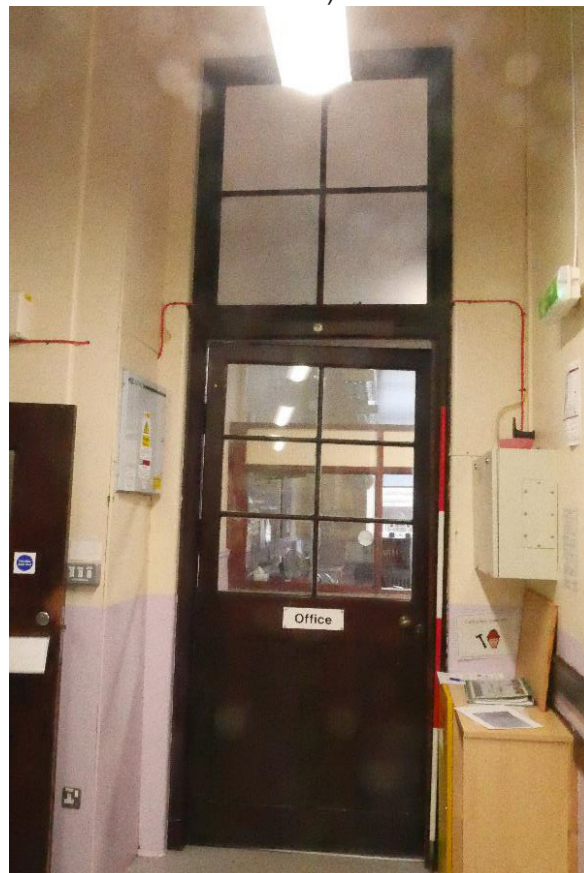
Detailed view of door leading into Room 0/3, looking south-east (© Derek Hall 2023)
